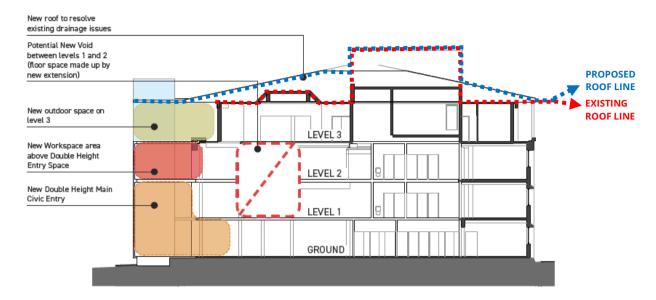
Schematic section showcasing the new roof (blue) proposed to be installed above the existing roof (red). Source: Lahznimmo + Antelope with Curio additions, 2021.
